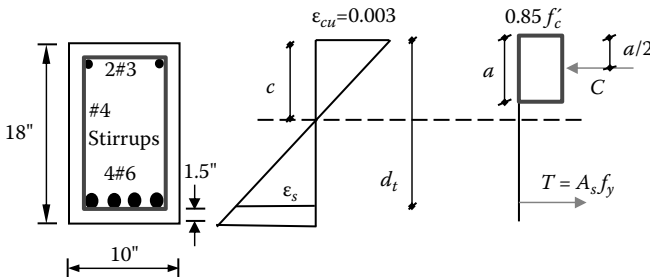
Cross-section details, strain, and force profile for Example 2.1.
